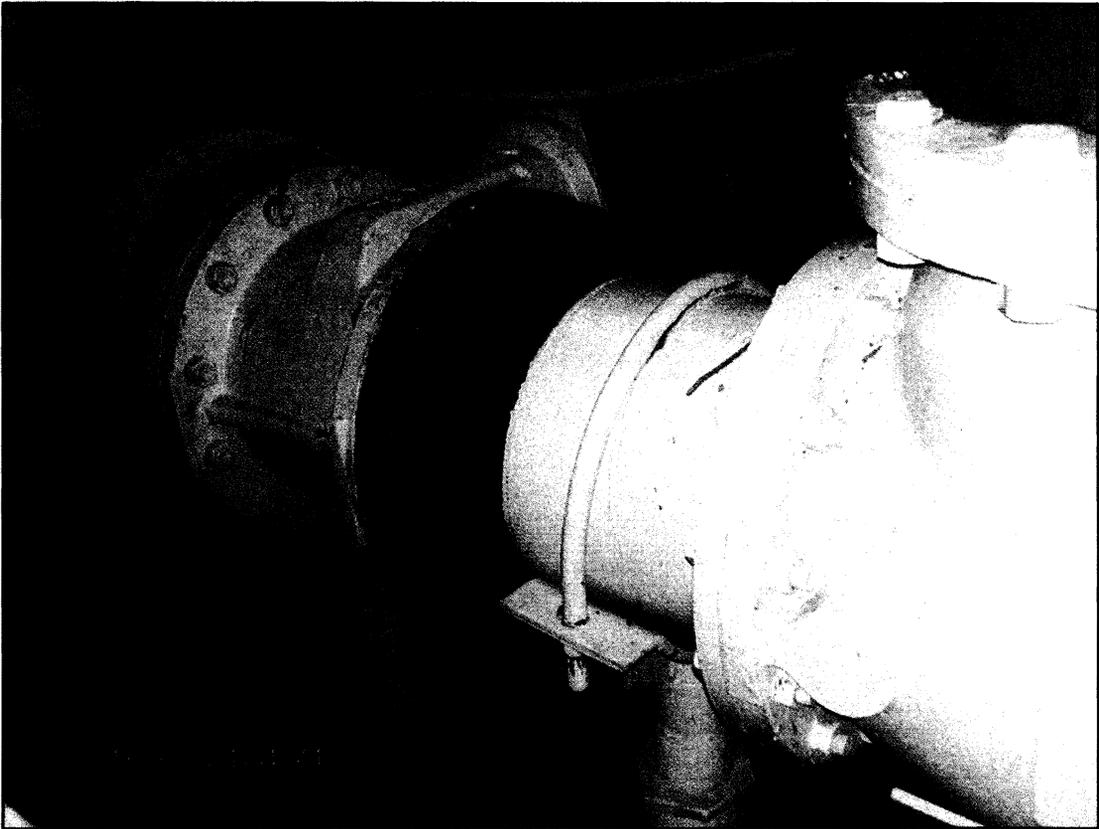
Pump #1 Discharge Piping (With Uni-Flange Coupling Removed and Blind Flange Temporarily Installed on Shut-Off Valve)
